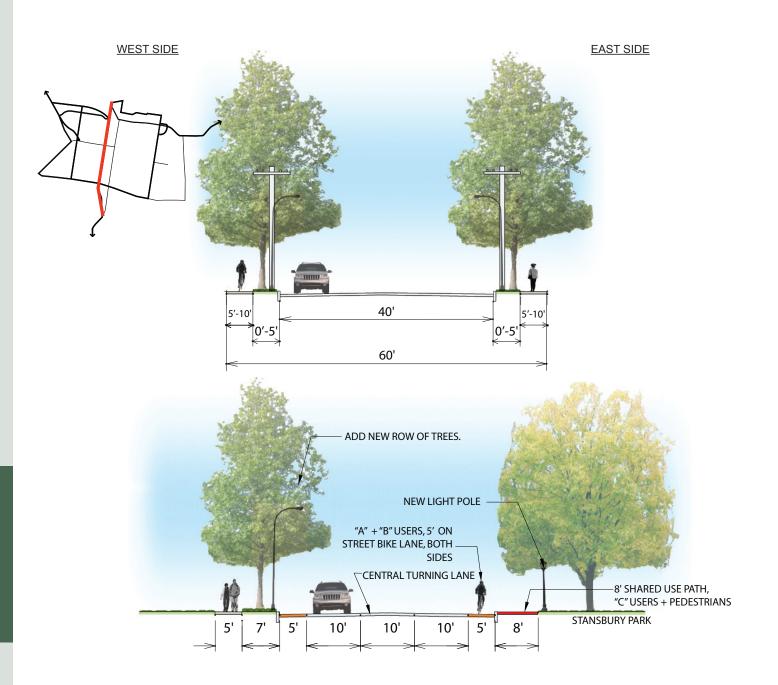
The Hub: Zone 1 4th Street & Stansbury Park Existing & Proposed Cross-Section
